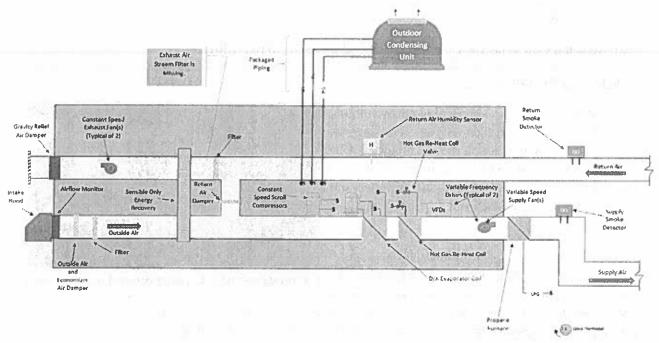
Typical Ground Mounted Packaged Rooftop Unit Schematic
